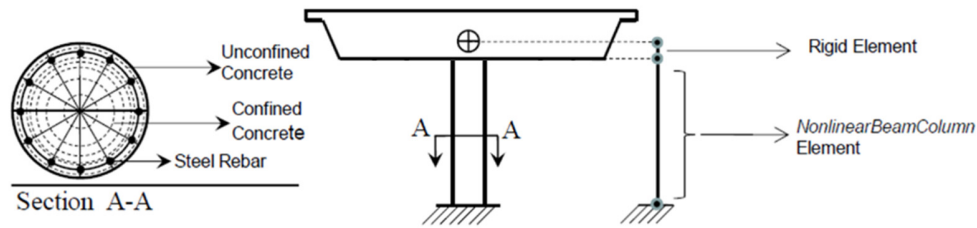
Column modeling scheme (Kavianijopari, 2011).
